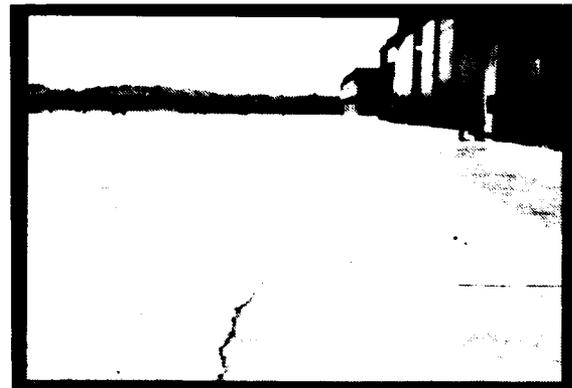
Evenly spaced cracks extending the length of the apron and isolated to a row of slabs. This type of distress is associated with the vibration and consolidation during construction. Recommend the cracks be cleaned and sealed.
